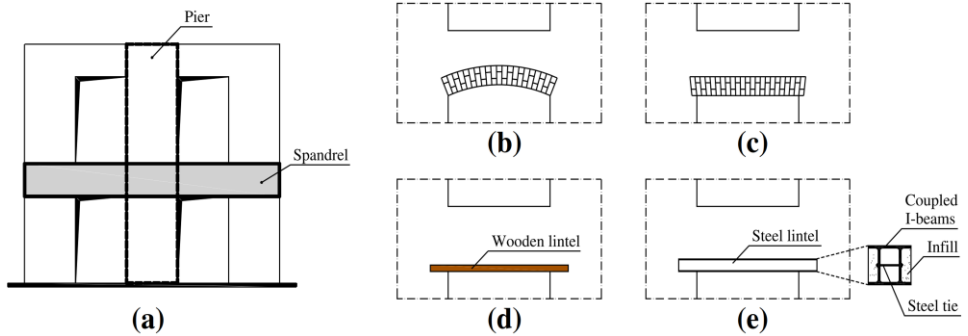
Typical masonry spandrels in existing old URM building [29]
